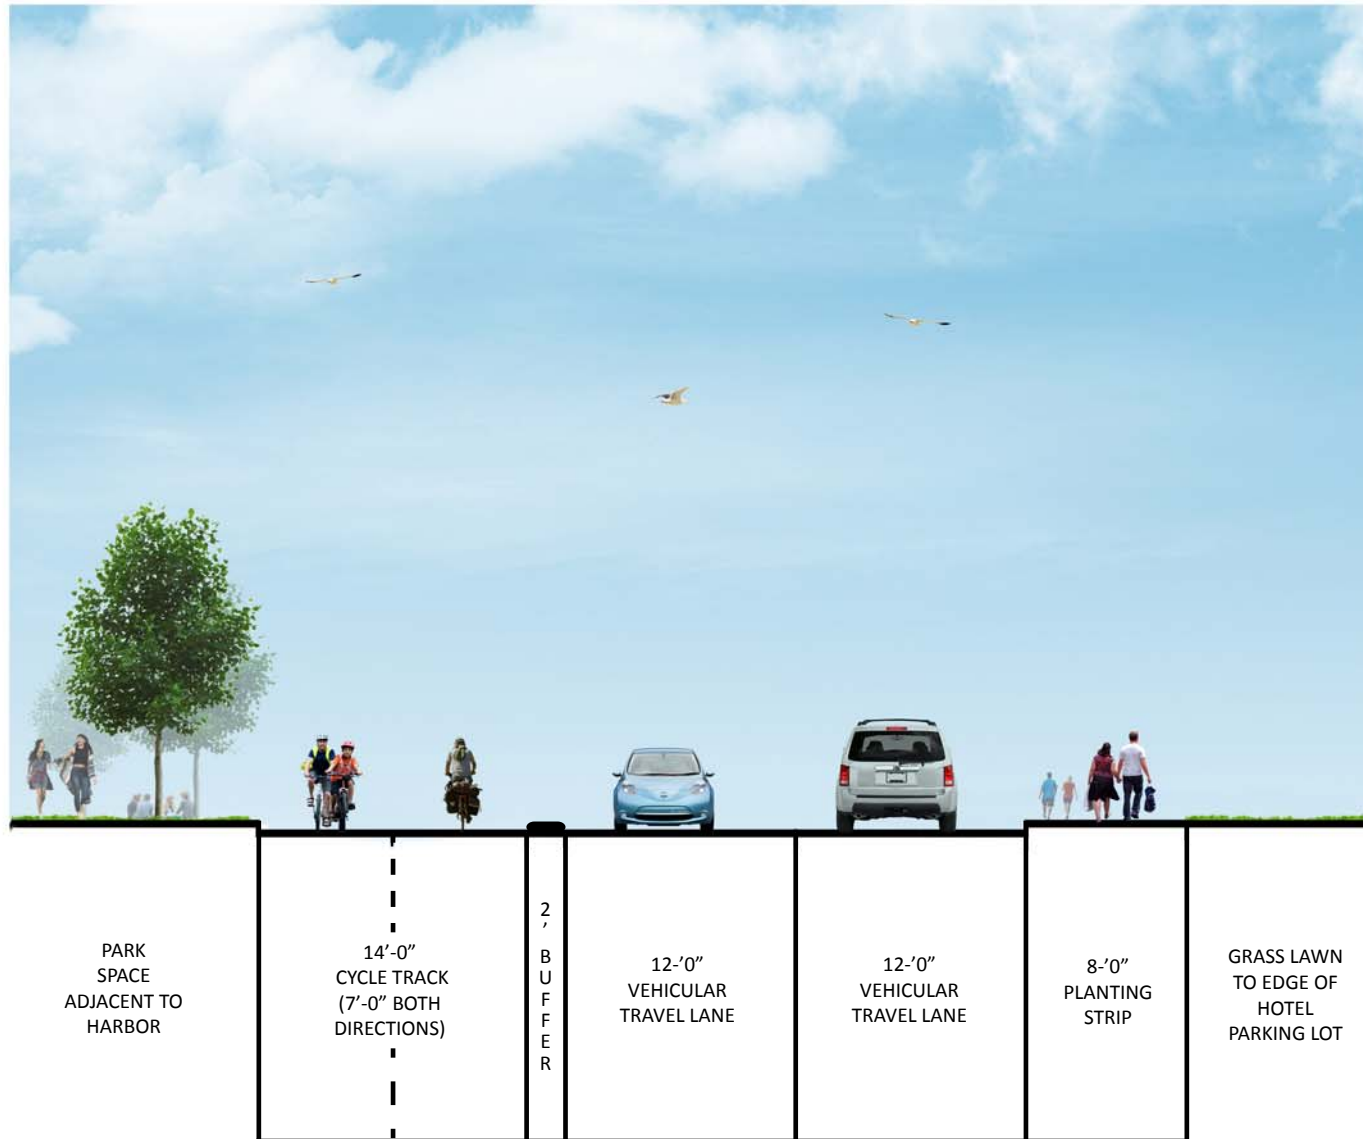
Section C1-C2: Street Type-Wurz Avenue Connector
